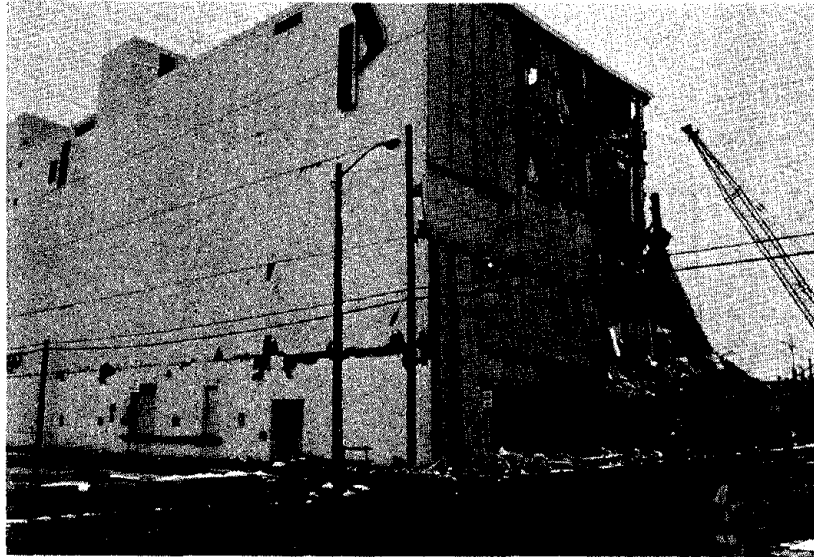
Precast Concrete Facade Connection Failure
